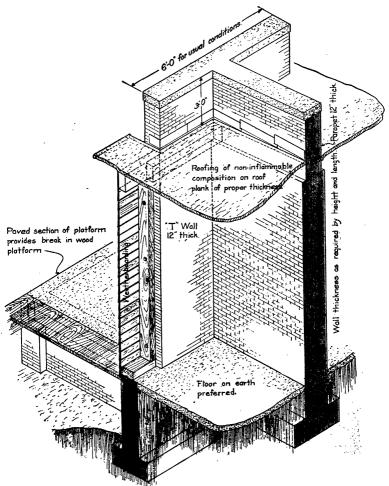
Method of forming fire stop by division fire wall without obstruction to platforms.
